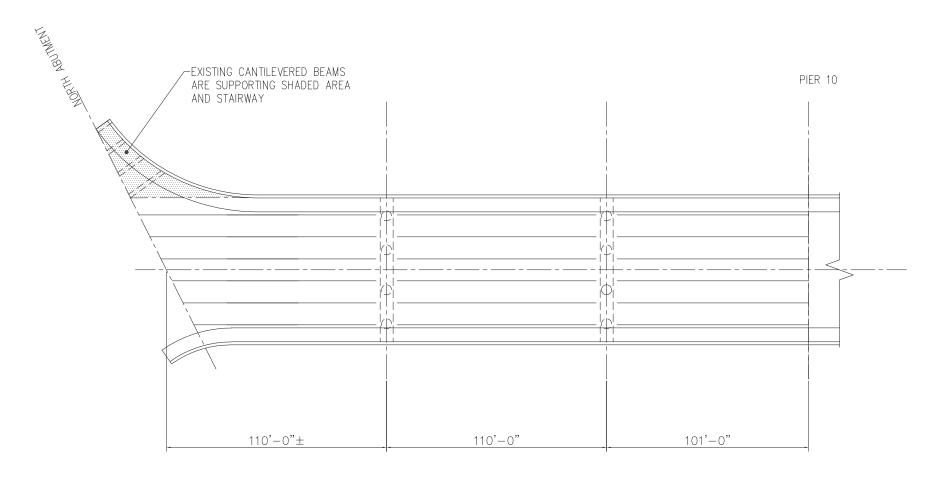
THREE SPAN PRECAST CONCRETE I-GIRDER DECK PLAN(TUB GIRDER SIMILAR)
